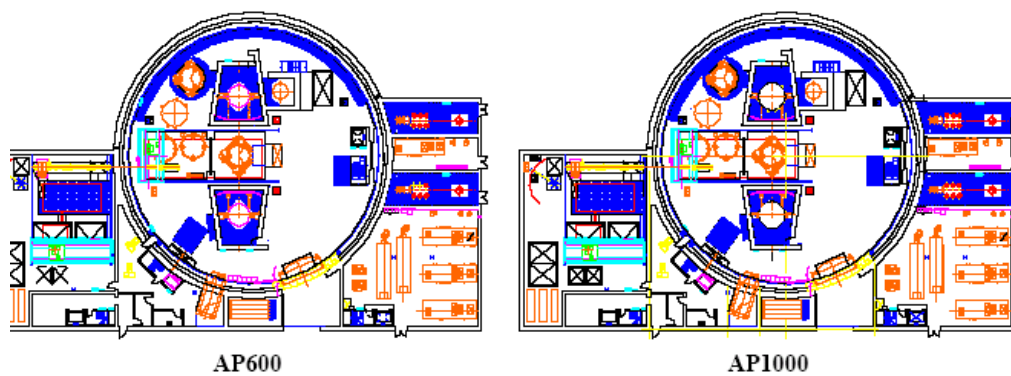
Westinghouse AP600 and AP1000 Plants (Plan)
